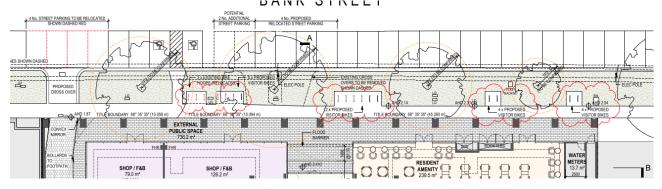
Proposed ground-floor plan showing the extent of visitor bicycle parking located on Bank Street.
